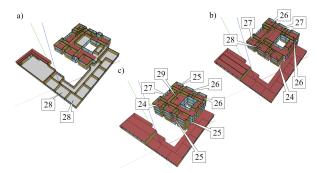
Schedule of classrooms used in the second shift: (a) Ground floor, (b) First floor, (c) Second floor
